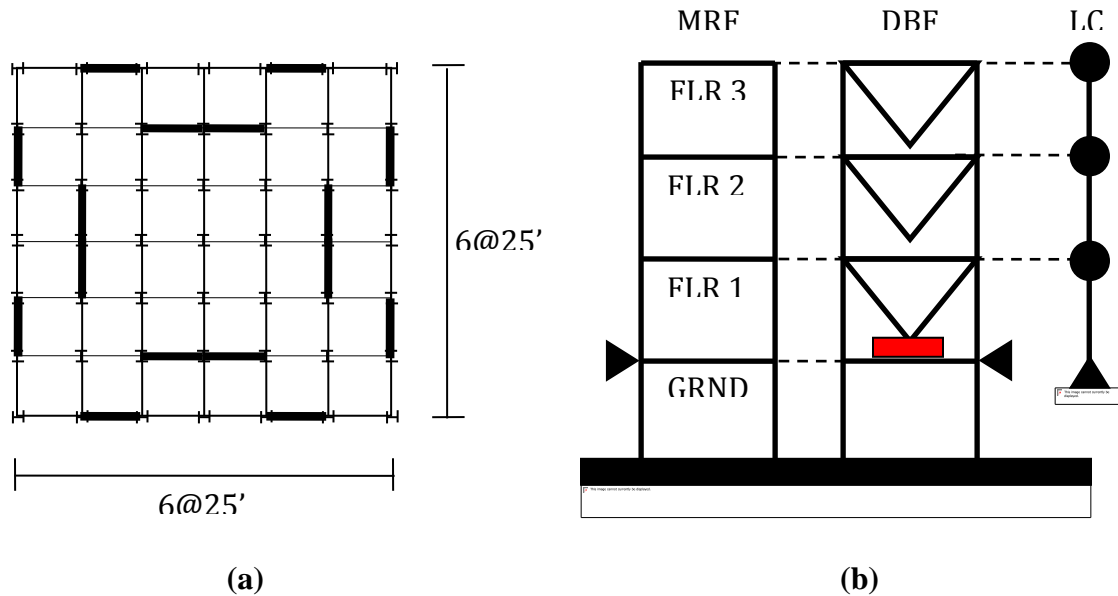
(a) Plan View of Structure and (b) Elevation View of MRF+DBF+LC
